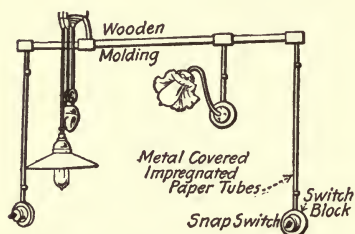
Fittings, wiring and fixtures used for a two-room residence at Milan, Italy.
